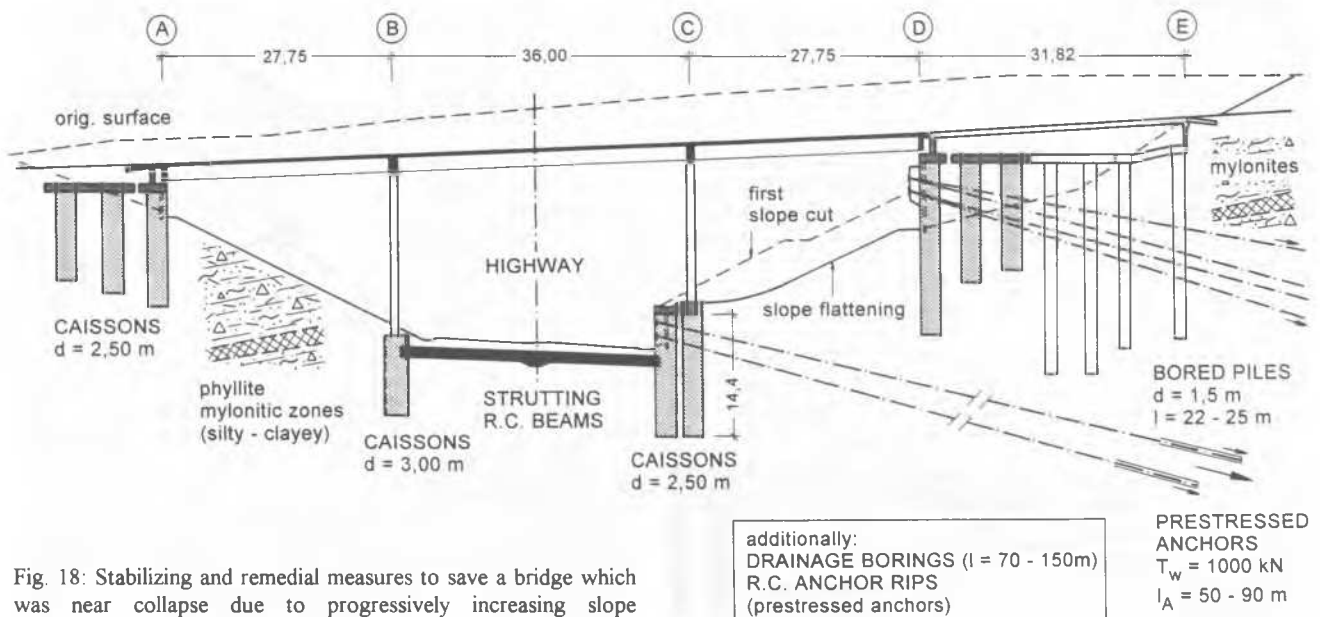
Stabilizing and remedial measures to save a bridge which was near collapse due to progressively increasing slope movements.
